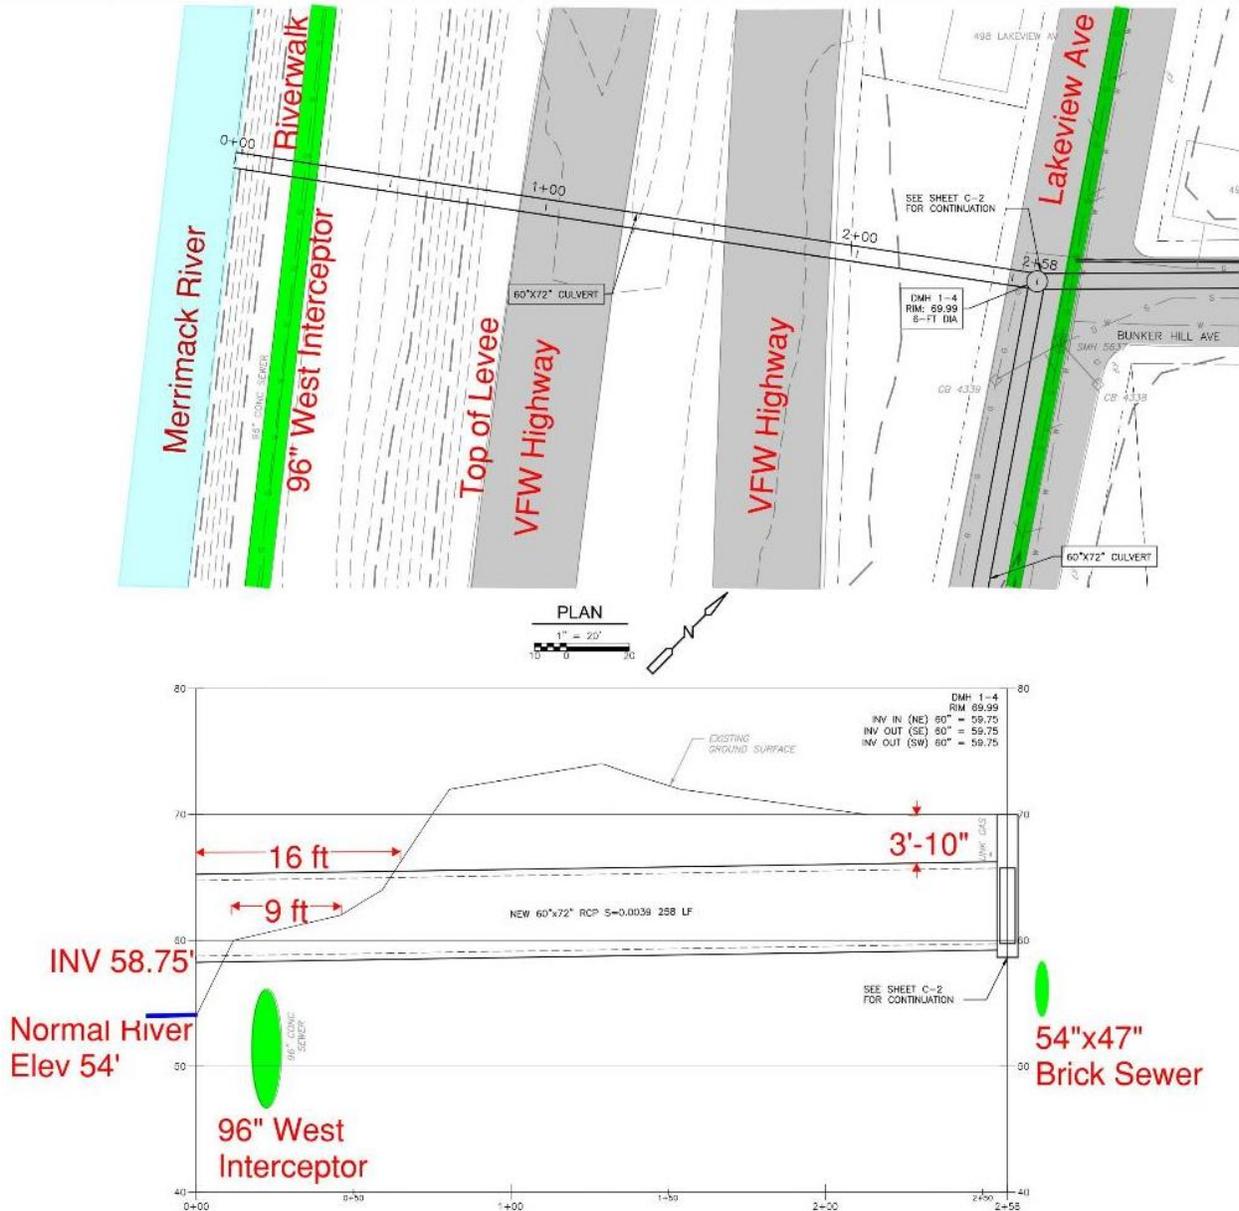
Plan and Profile, Bunker Hill Outfall at VFW Highway
